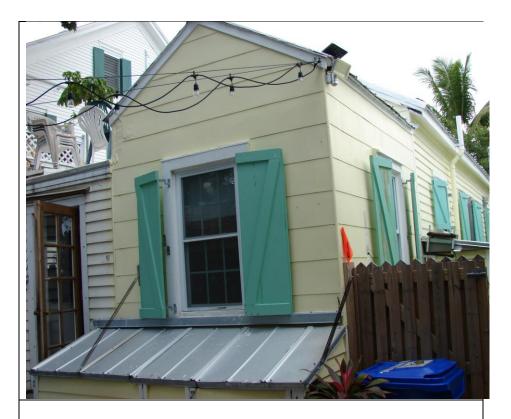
1404 Olivia House: View from Rear -Existing
